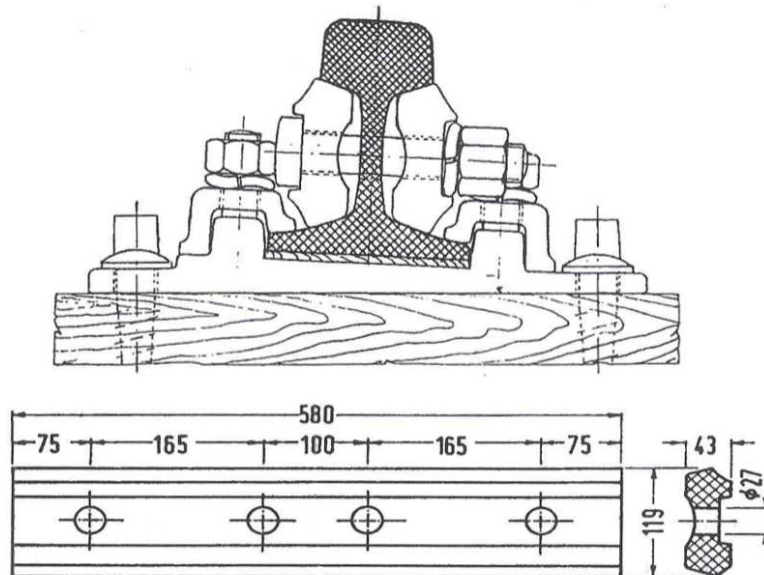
Section of the clamp and section of assembled joint with rail, [36]
